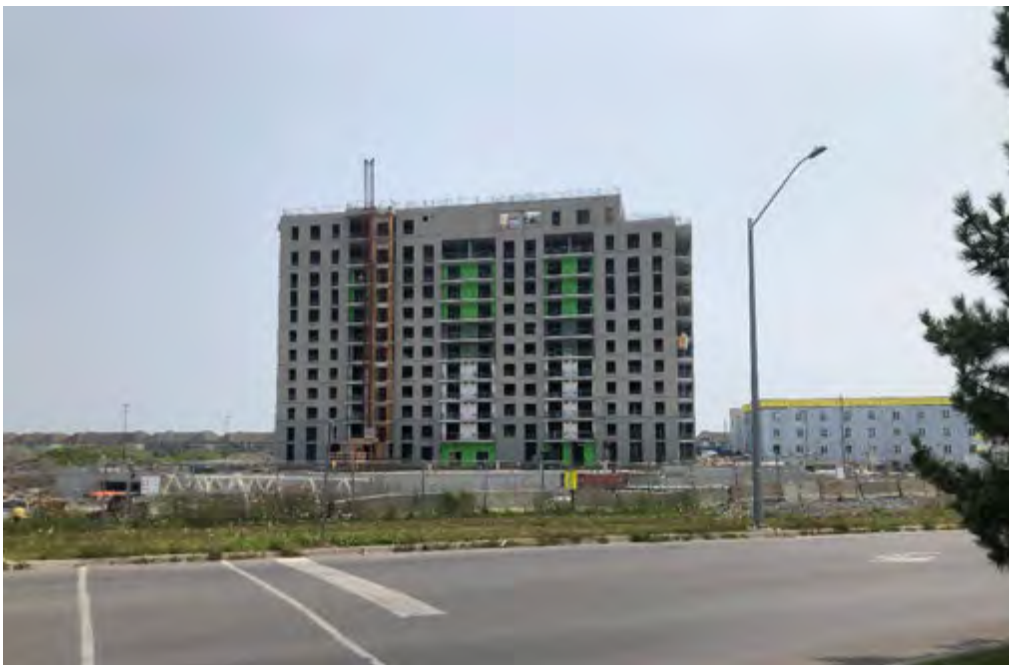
Looking south-east from Rockwell Drive to the apartment at 1560 Rockwell Drive and the long-term care facility at 1306 Demers Avenue (under construction).
